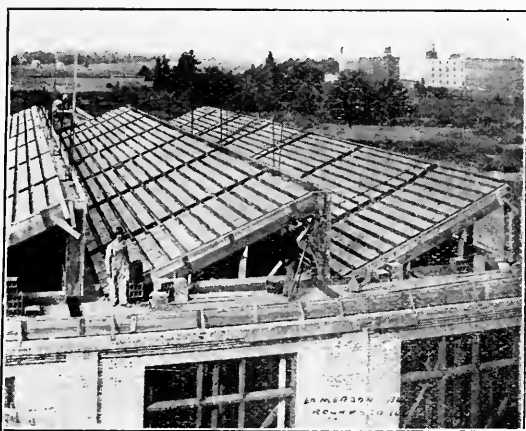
SHOWING METHOD OF LAYING TILE AND CONCRETE FOR SAW TOOTH ROOF.
